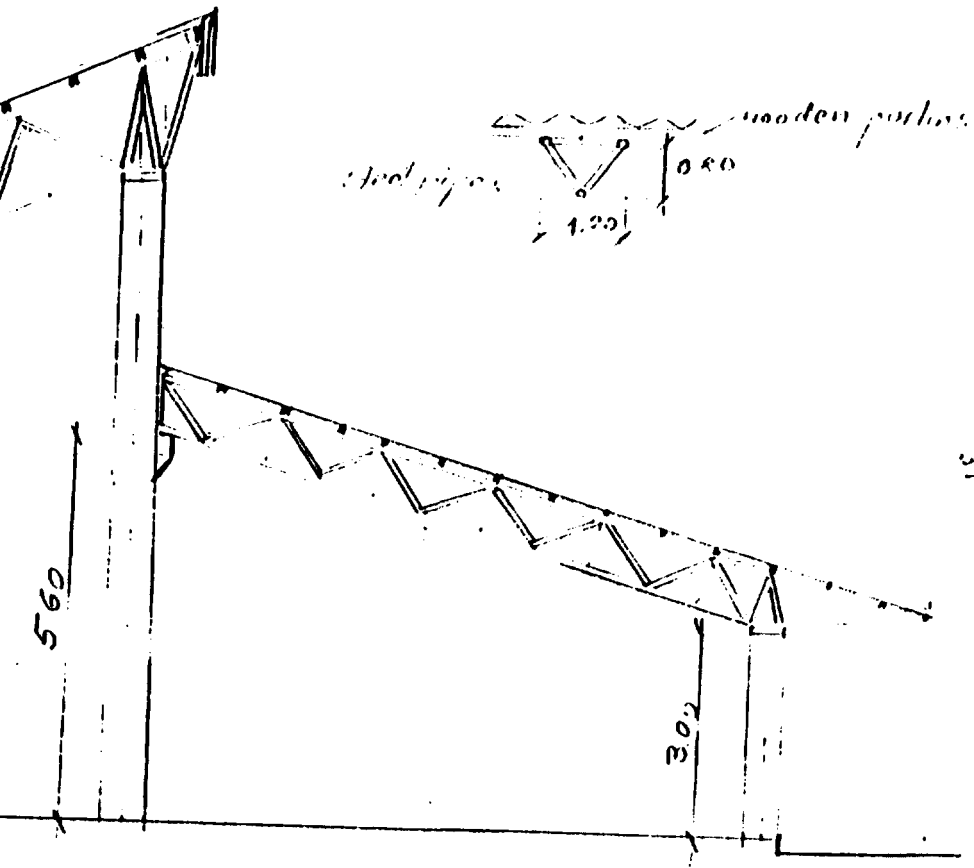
Proposition of structural solution of the boatbuilding and repair hall-busses from steel pipes
